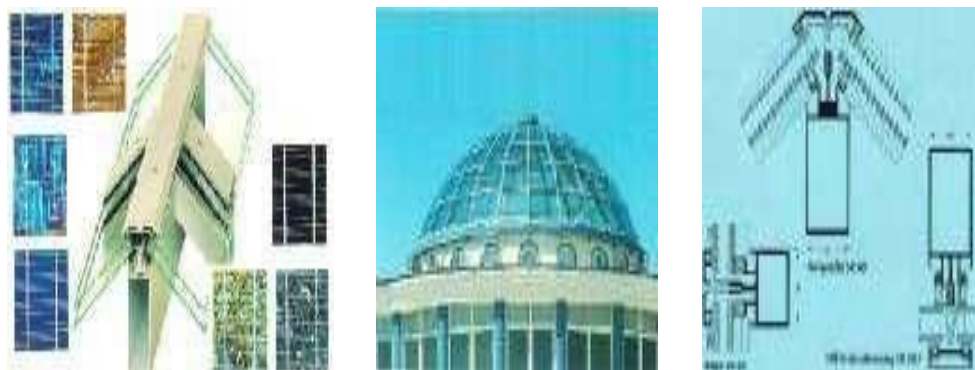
Curved roof overlay detail (Keles, 2008)
